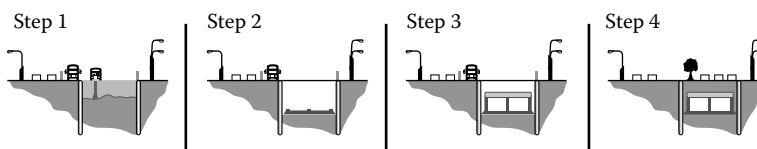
Stages of applying the cut and cover technique. (Adapted from FHWA. 2013, Technical Manual for Design and Construction of Road Tunnels – Civil Elements, Federal Highway Administration – U.S. Department of Transportation, Chapter 5 – Cut and Cover Tunnels, available at: <http://www.fhwa.dot.gov/bridge/2013> (accessed 14 March 2015).)
